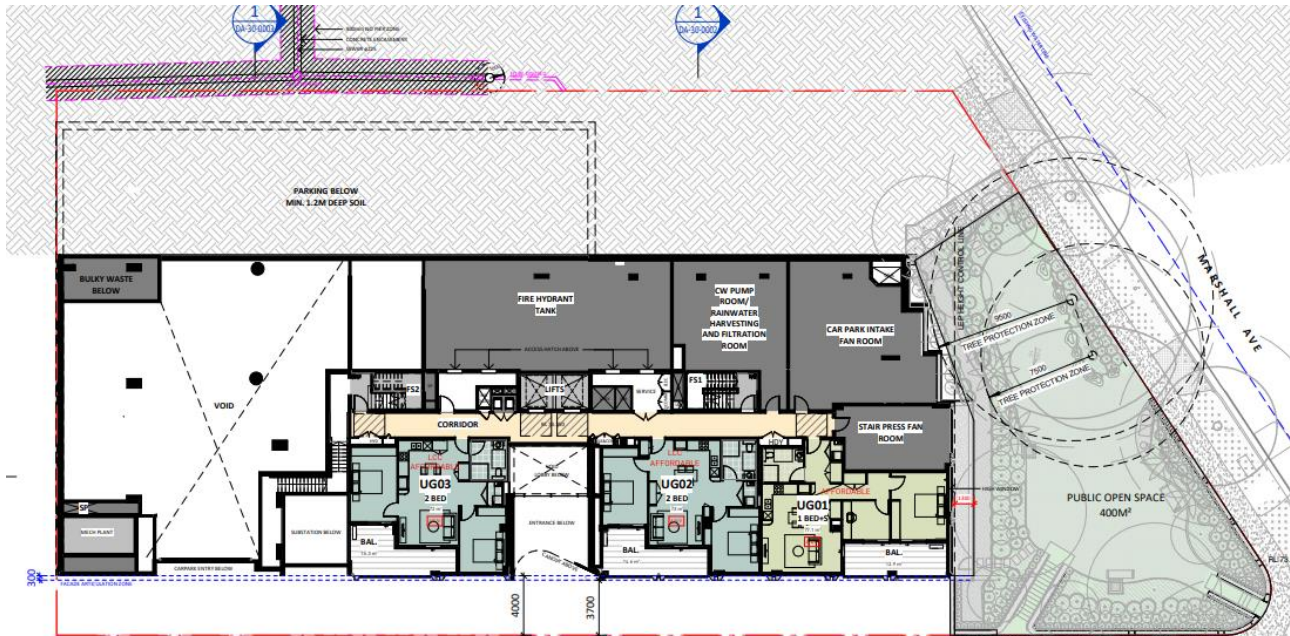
Upper Ground Floor Modifications (Source: Plans)
